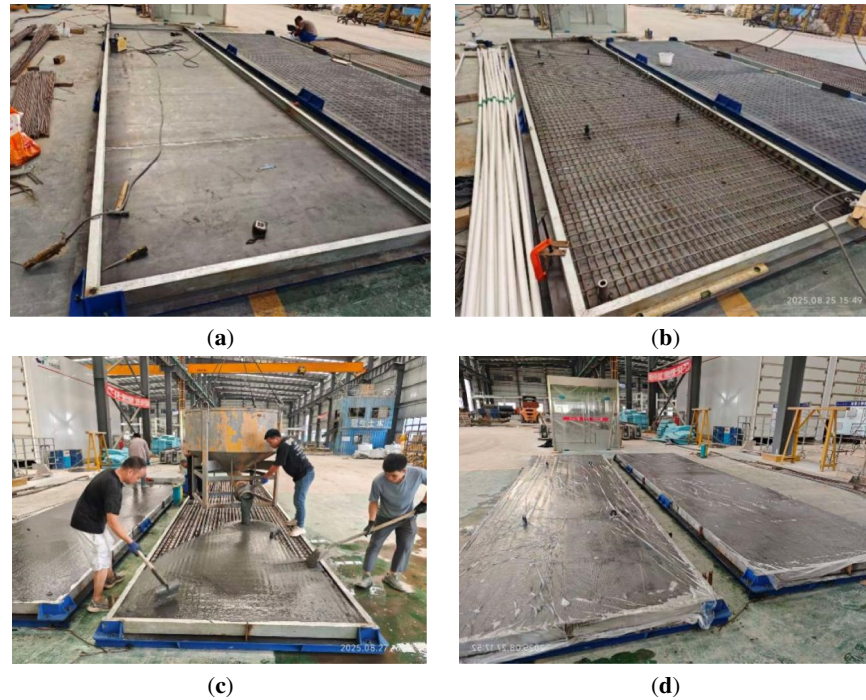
Illustration of specimen fabrication (a) fabrication of steel frame; (b) placement of reinforcement; (c) casting of UHPC; (d) curing process.
